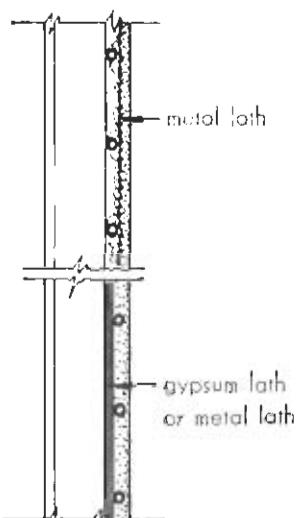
TYPICAL CEILING PANEL CONSTRUCTION
